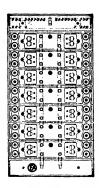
View of a 28-Circuit Lighting Cabinet Courtesy of Frank Adam Electric Company
